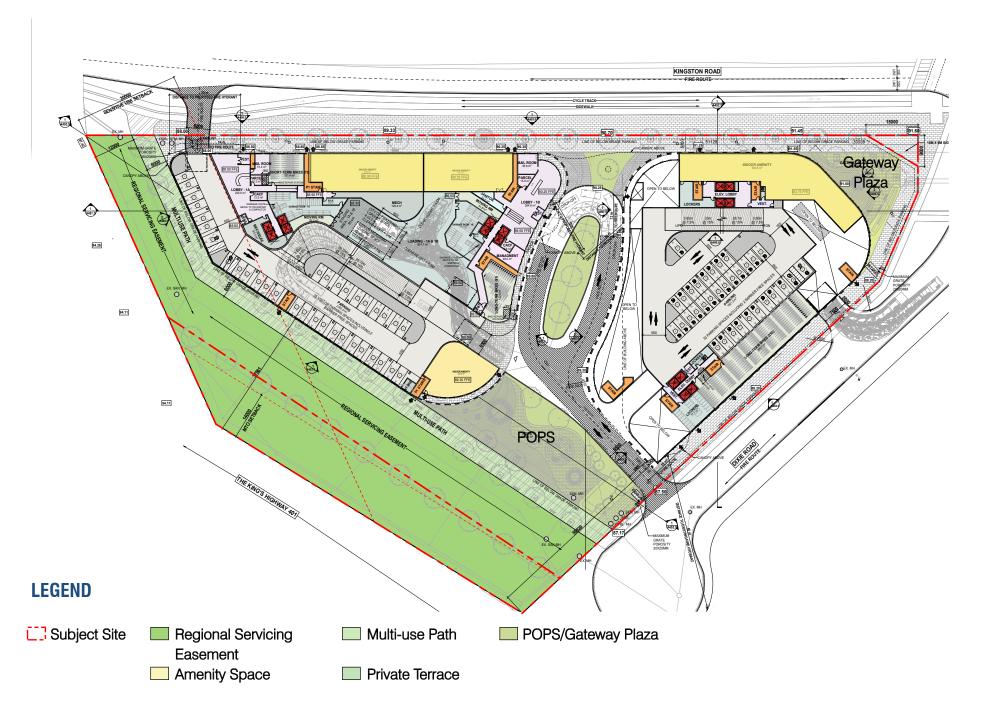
Amenity Area Ground Floor and Mezzanine Level
